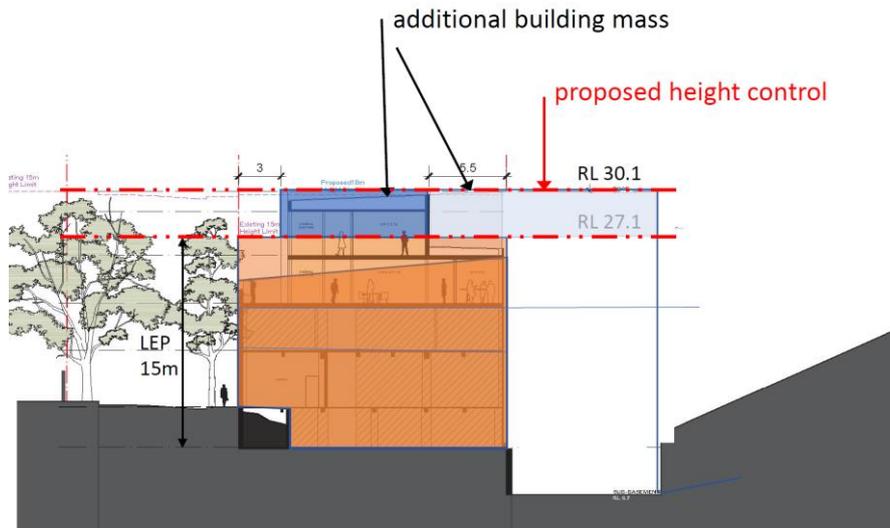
Cross section showing the additional building mass in blue between the current and proposed height controls compared to the existing building shown in orange.
